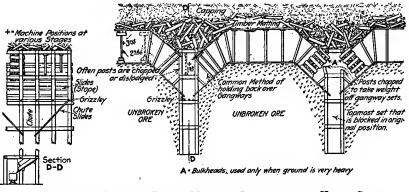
SECTION SHOWING TIMBER MAT AND BULKHEADS FOR HEAVY GROUND
